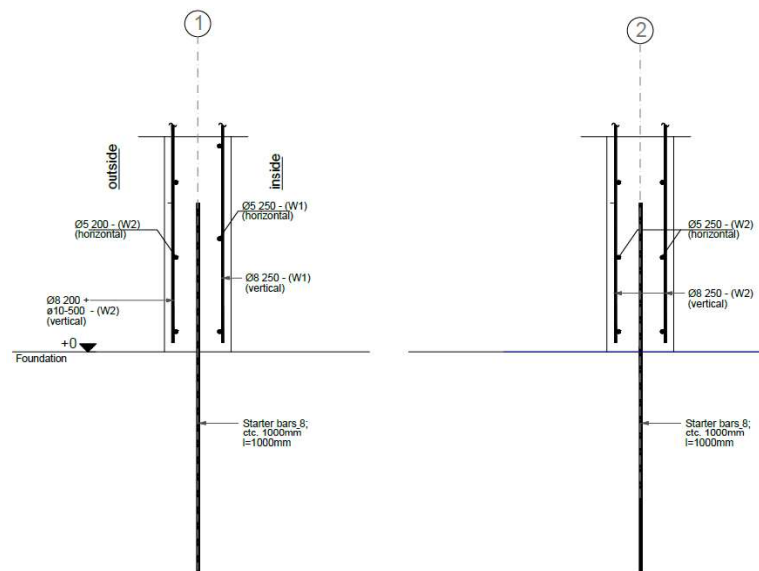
Longitudinal section of the external (left) and central (right) walls of the specimen EUC-BUILD-3 and respective horizontal and vertical reinforcements. The figure also shows the starter bars. Adapted from [Brunesi et al, 2017].
